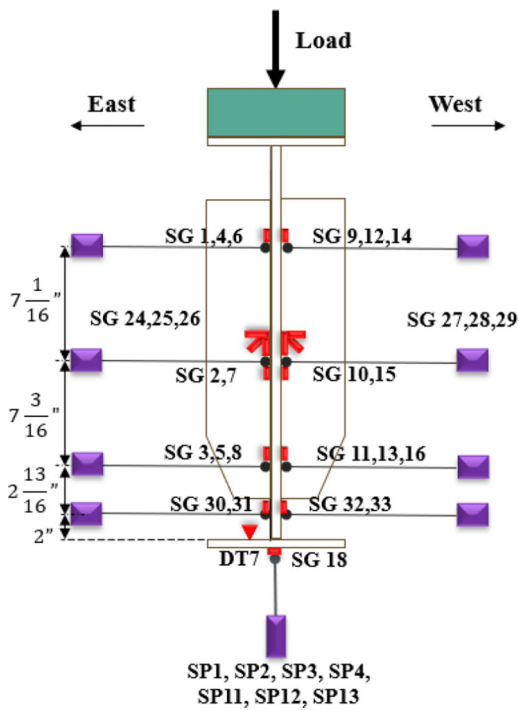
Strain gauge layout (front elevation): Specimens 1–6.
